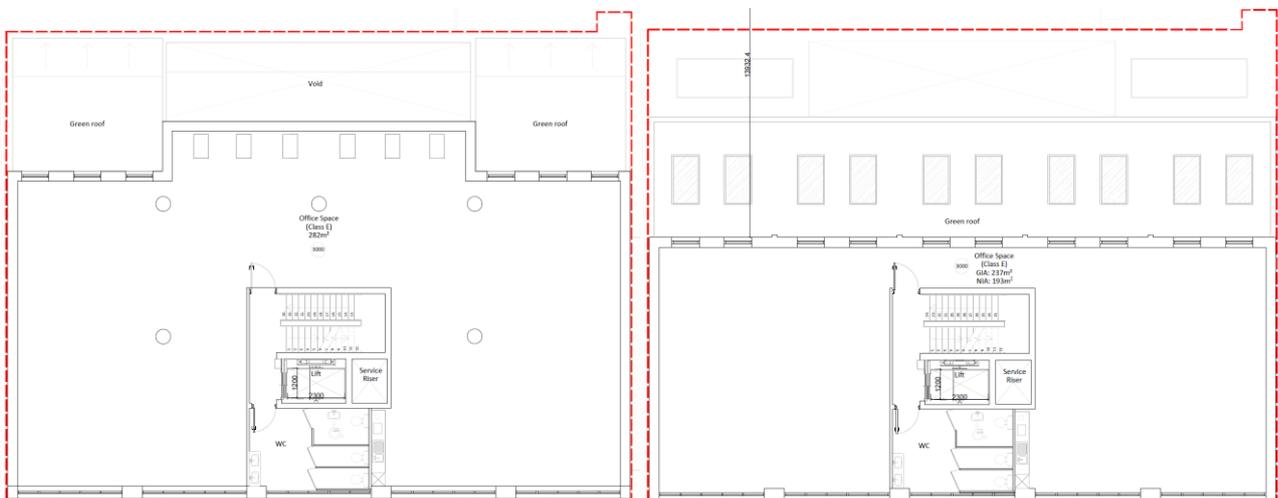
Second floor of refused scheme (left) and current revised application (right)
